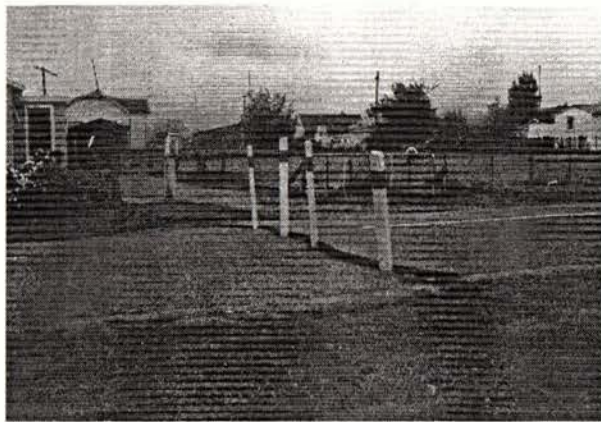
Crack across Hotham Street, Murchison (photo courtesy Dr. John Collen)
